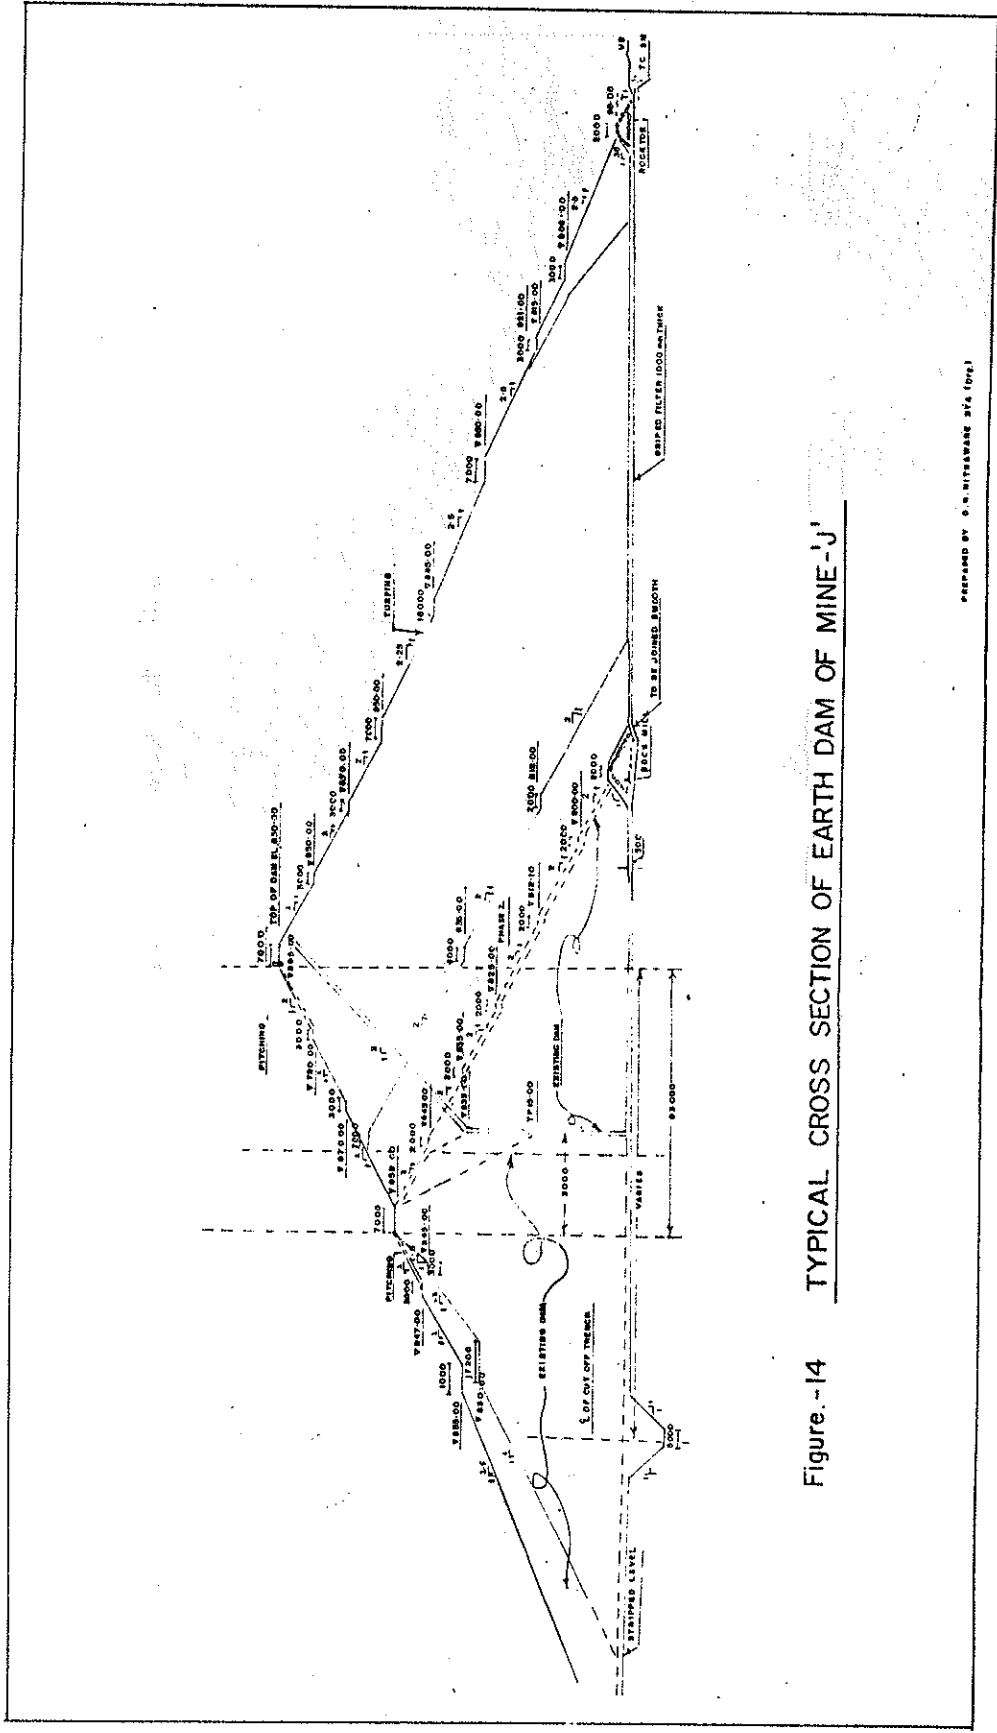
TYPICAL CROSS SECTION OF EARTH DAM OF MINE -J'
